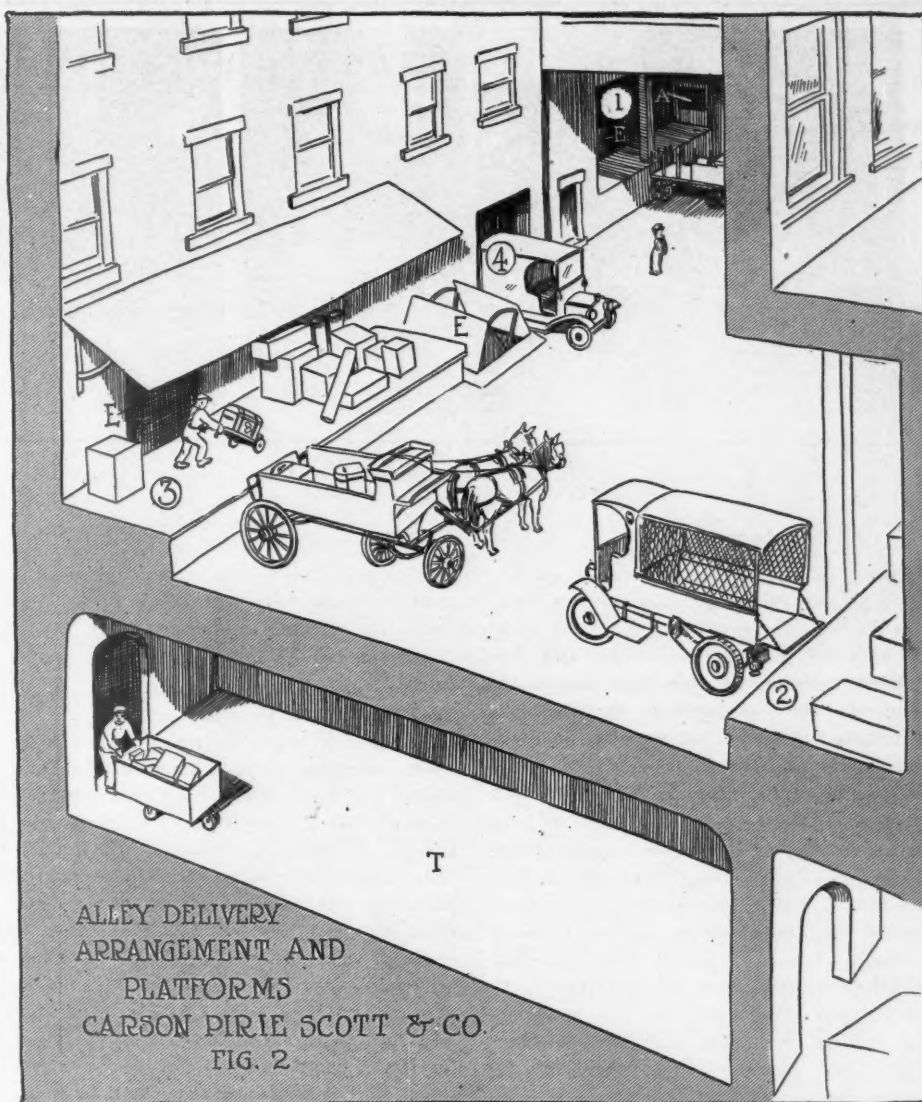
ALLEY DELIVERY ARRANGEMENT AND PLATFORMS AT CARSON, PIRIE, SCOTT & CO.'S.
